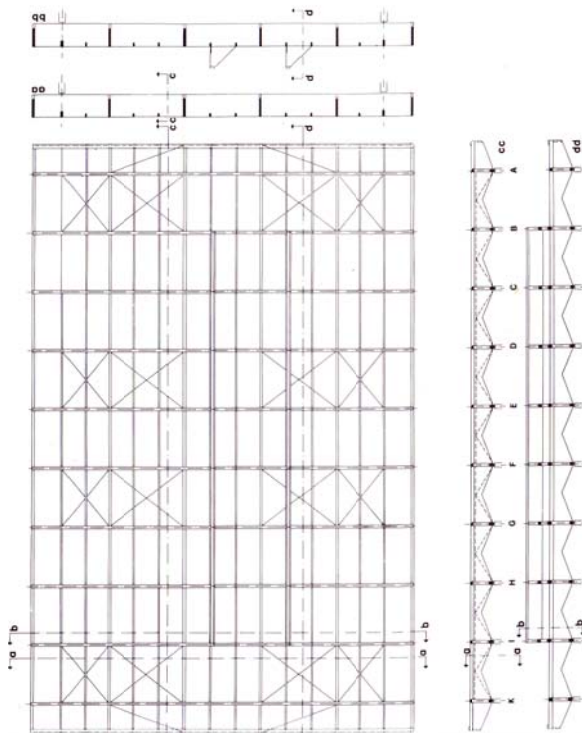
Layout of the arena and side view of the girders (extracted from [1])
